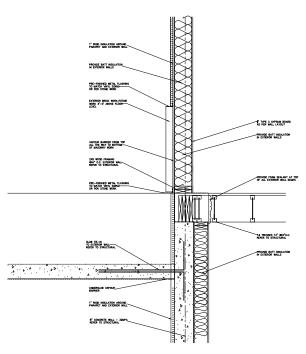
CONCRETE FLOOR/WALL DETAIL
